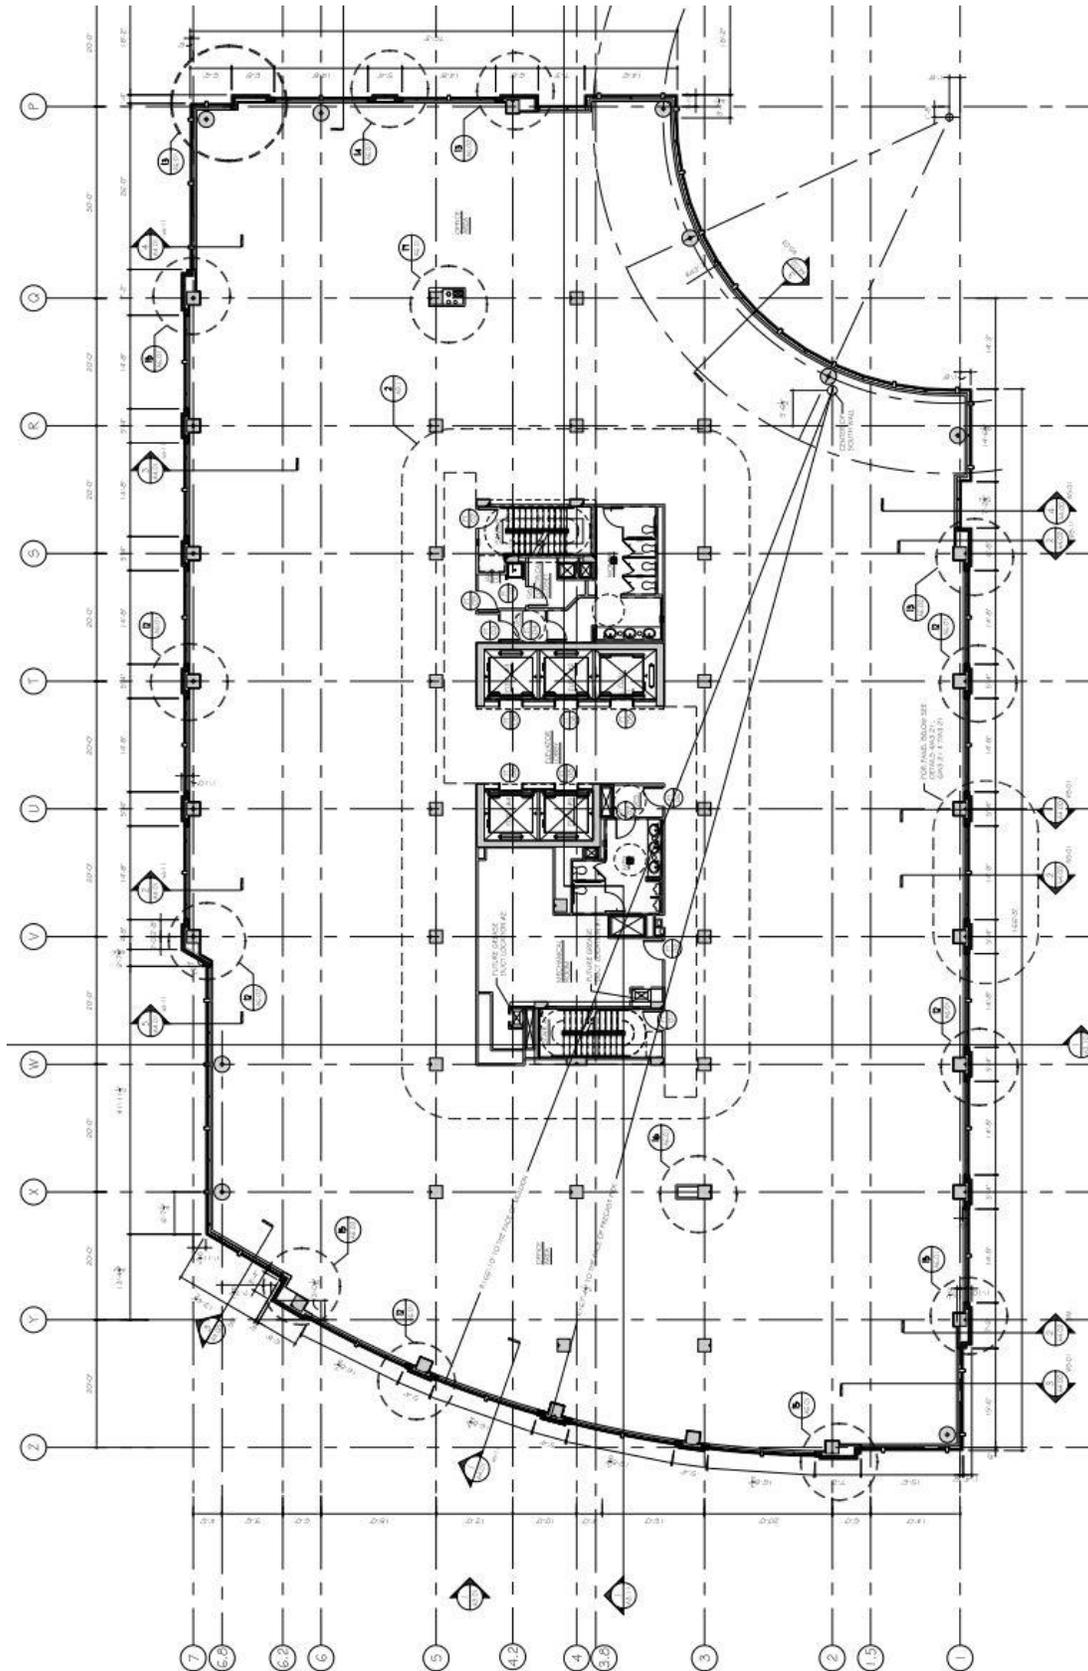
Typical Office Floor Plan – A2.19 of Construction Documents
